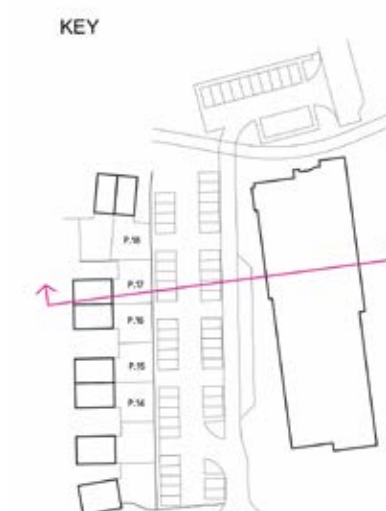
Local Centre & Plot 16 & 17 Third Floor Privacy Section post Design Workshop/Update
